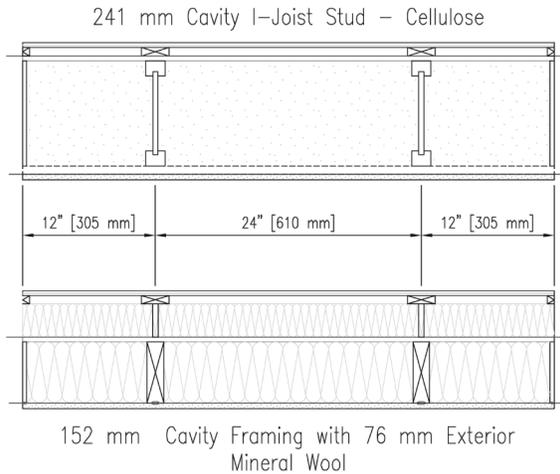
TYPICAL PLAN DIAGRAMS OF TEST PANEL FRAMING FOR THE TYPE 2 I JOIST (TOP) AND TYPE 7 EXTERIOR INSULATED (BOTTOM)
